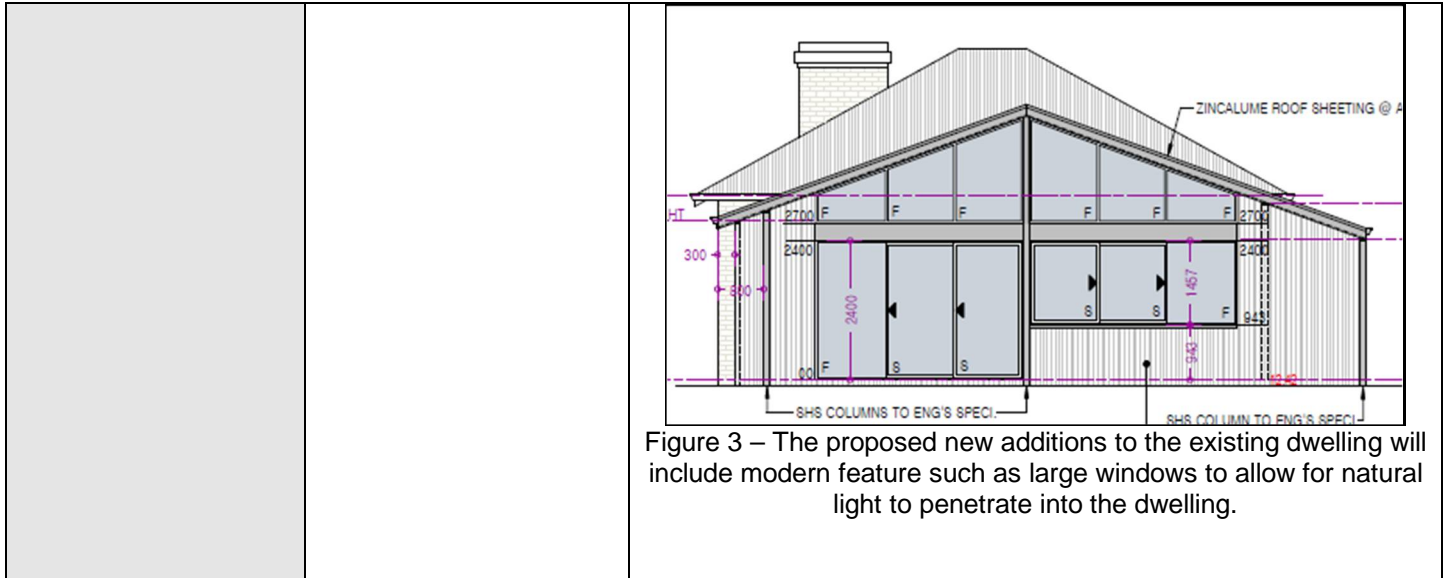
The proposed new additions to the existing dwelling will include modern feature such as large windows to allow for natural light to penetrate into the dwelling.
